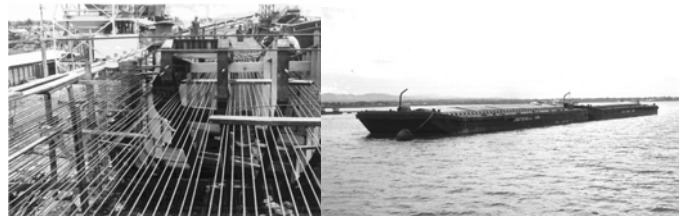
One of The world's first prestressed concrete barges launched in 1964 (Pérez Fernández & Lamas Pardo, 2013).
